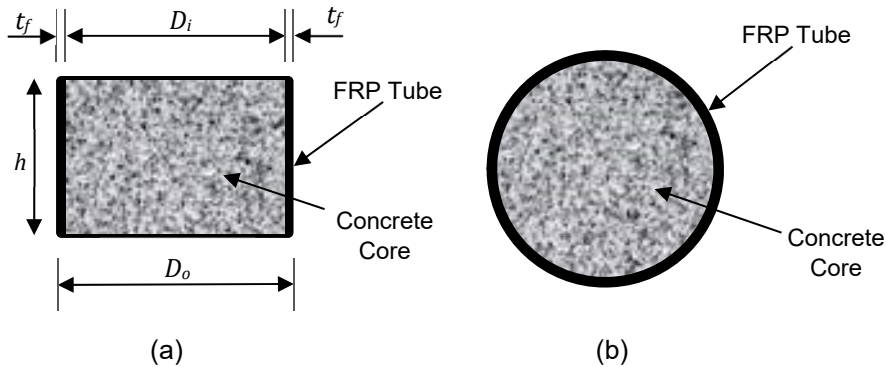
Schematic showing specimen details: (a) Cross-sectional elevation, (b) Cross-section view
